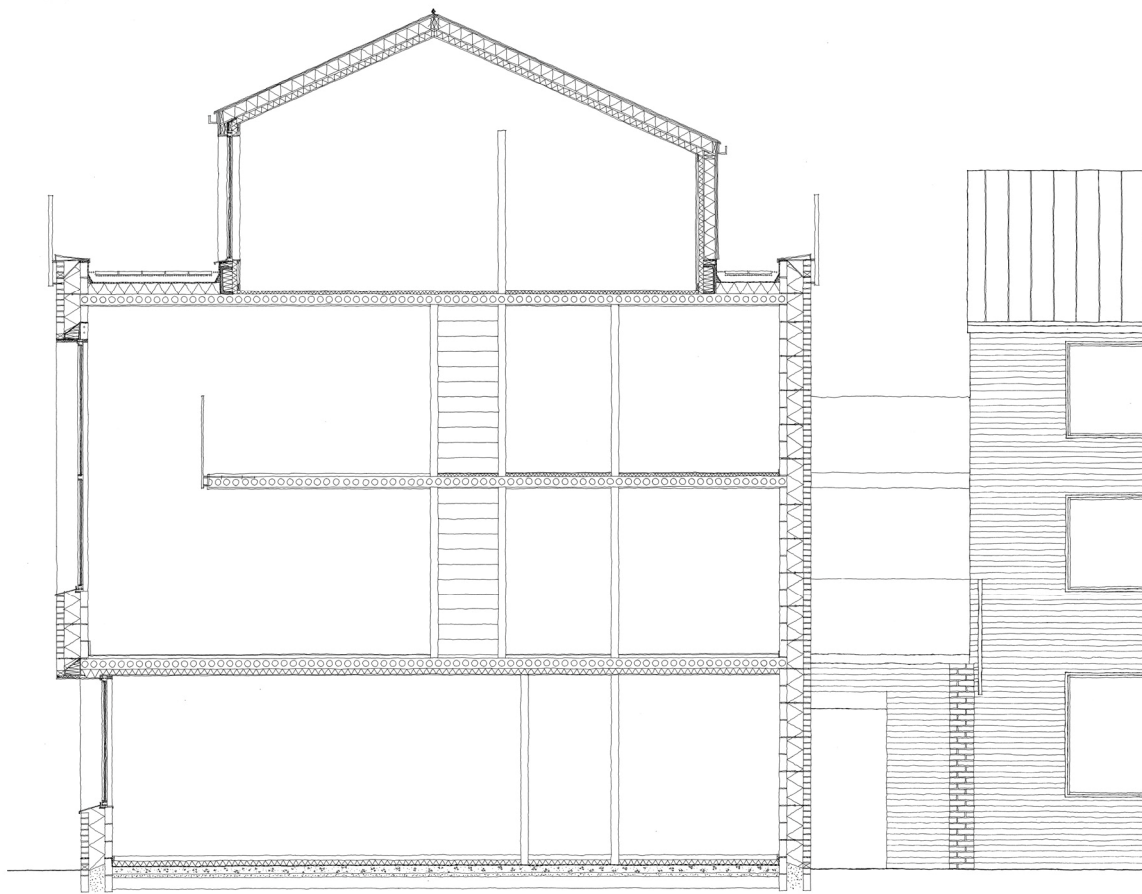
Construction section through duplex workplace dwelling 1:100. The primary construction uses conventional building materials of facing brick, structural concrete blockwork and concrete slab floors. The cavity is completely filled with 2 layers of 100mm glass wool insulation batts which a thermal conductivity of 0.032W/mK. The large cavity means Teplo wall ties are required. The top storey is a prefabricated element made of OSB and clad in zinc.
